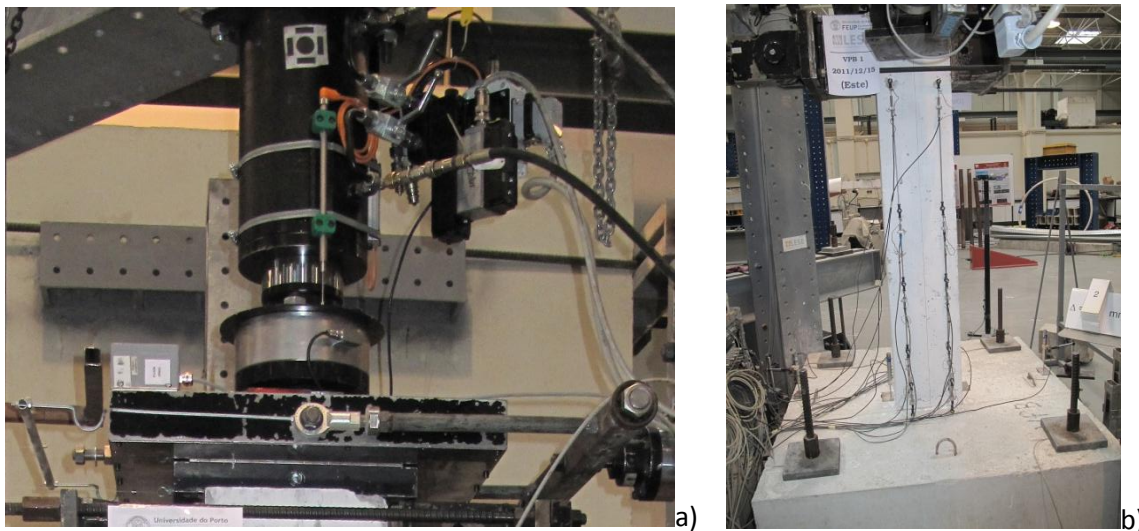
Details of testing setup: a) The axial load sliding device; b) LVDTs
